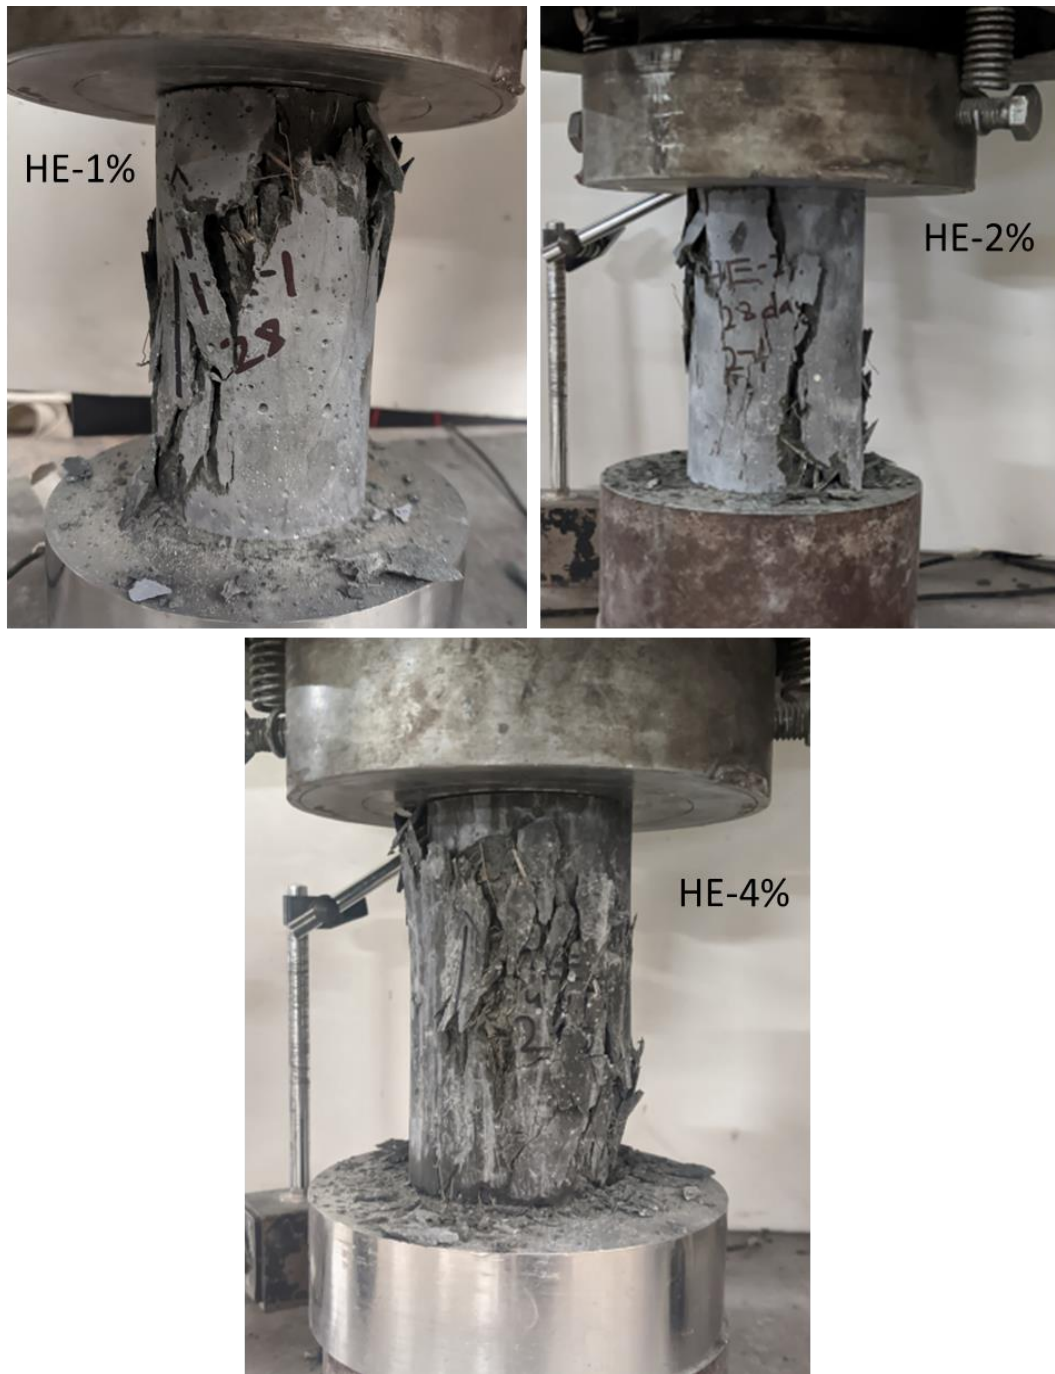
Failure pattern of J3 cylindrical specimens with hooked-end fibers under axial compressive load.
